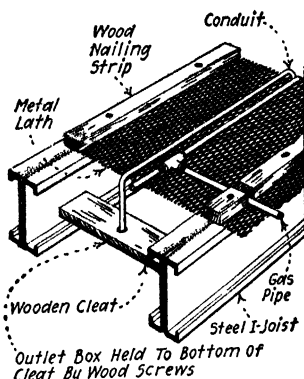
Ceiling outlet in steel "lumber" floor slab where wooden floor is to be used.
